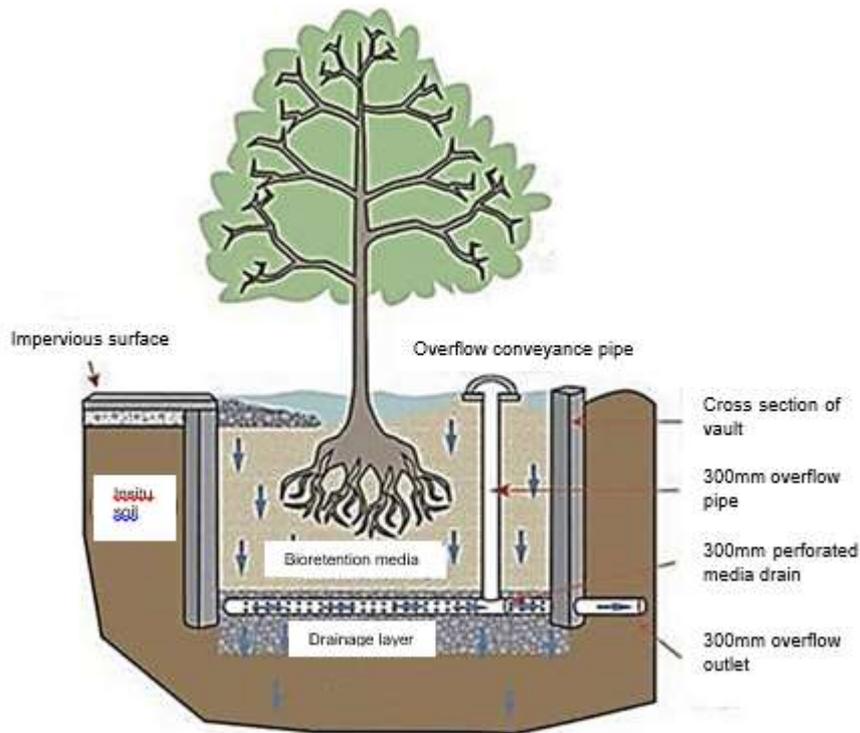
Schematic of a planter box cross section¹⁰⁸
